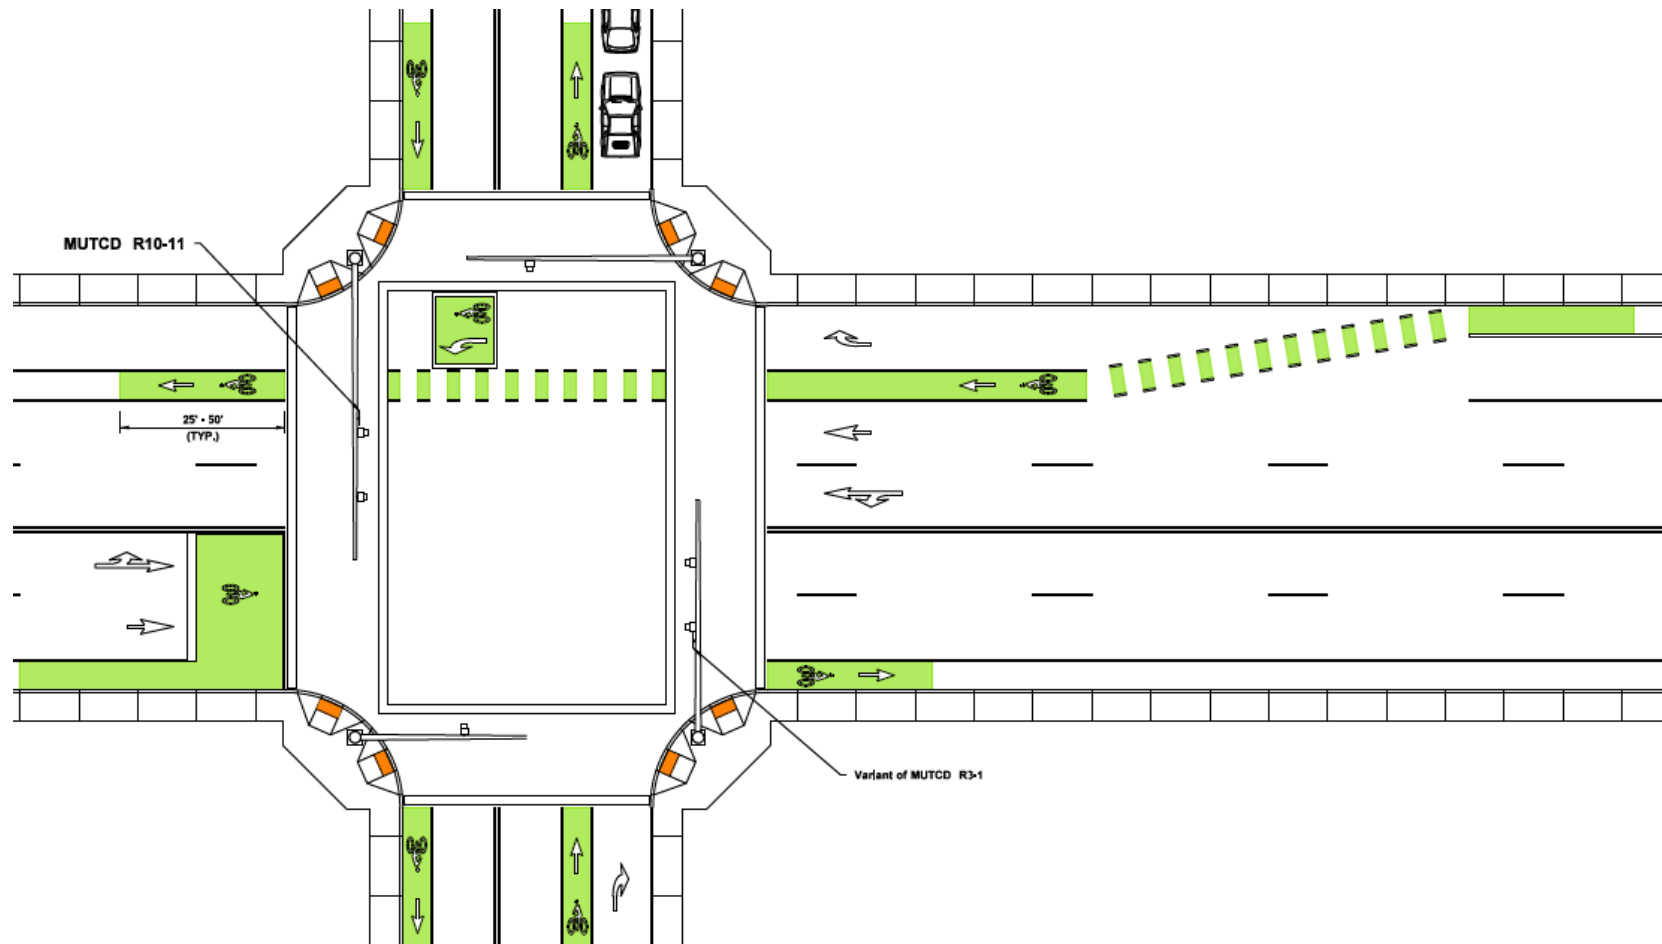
Bike Box and Intersection Crossing Markings
